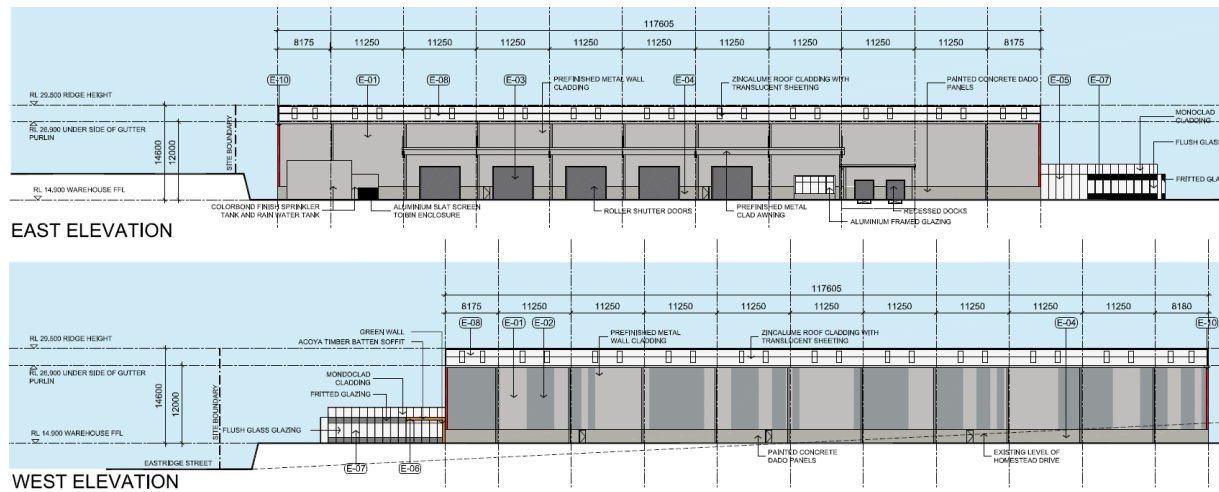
Proposed east and west elevation (Source: Frasers Property)
